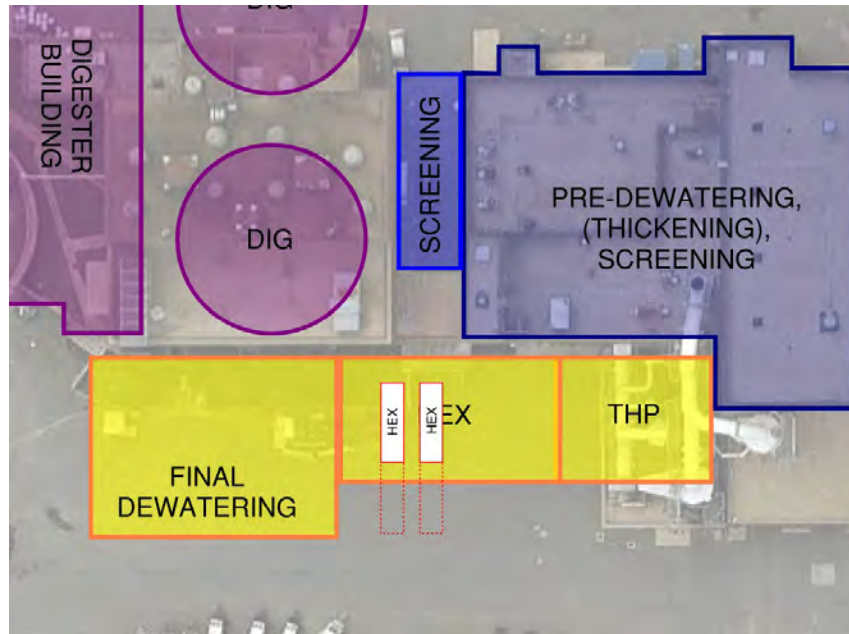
Once-Through Cooling: Equipment Plan View—Renovate Dewatering Building Option
